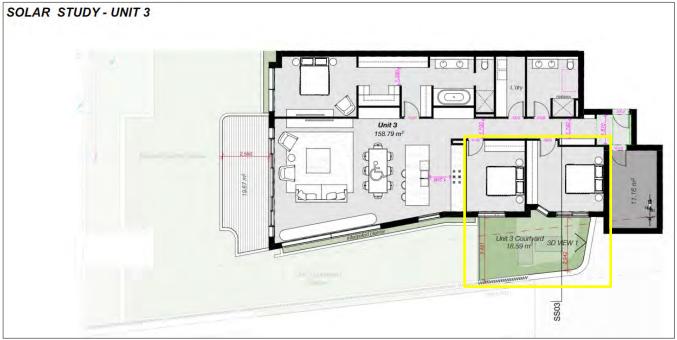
Extract of DWG No. 9409. As outlined in a yellow, the bedroom layout in Unit 3 has been amended to step out into western elevation providing improved solar access (Source: MHNDU)
